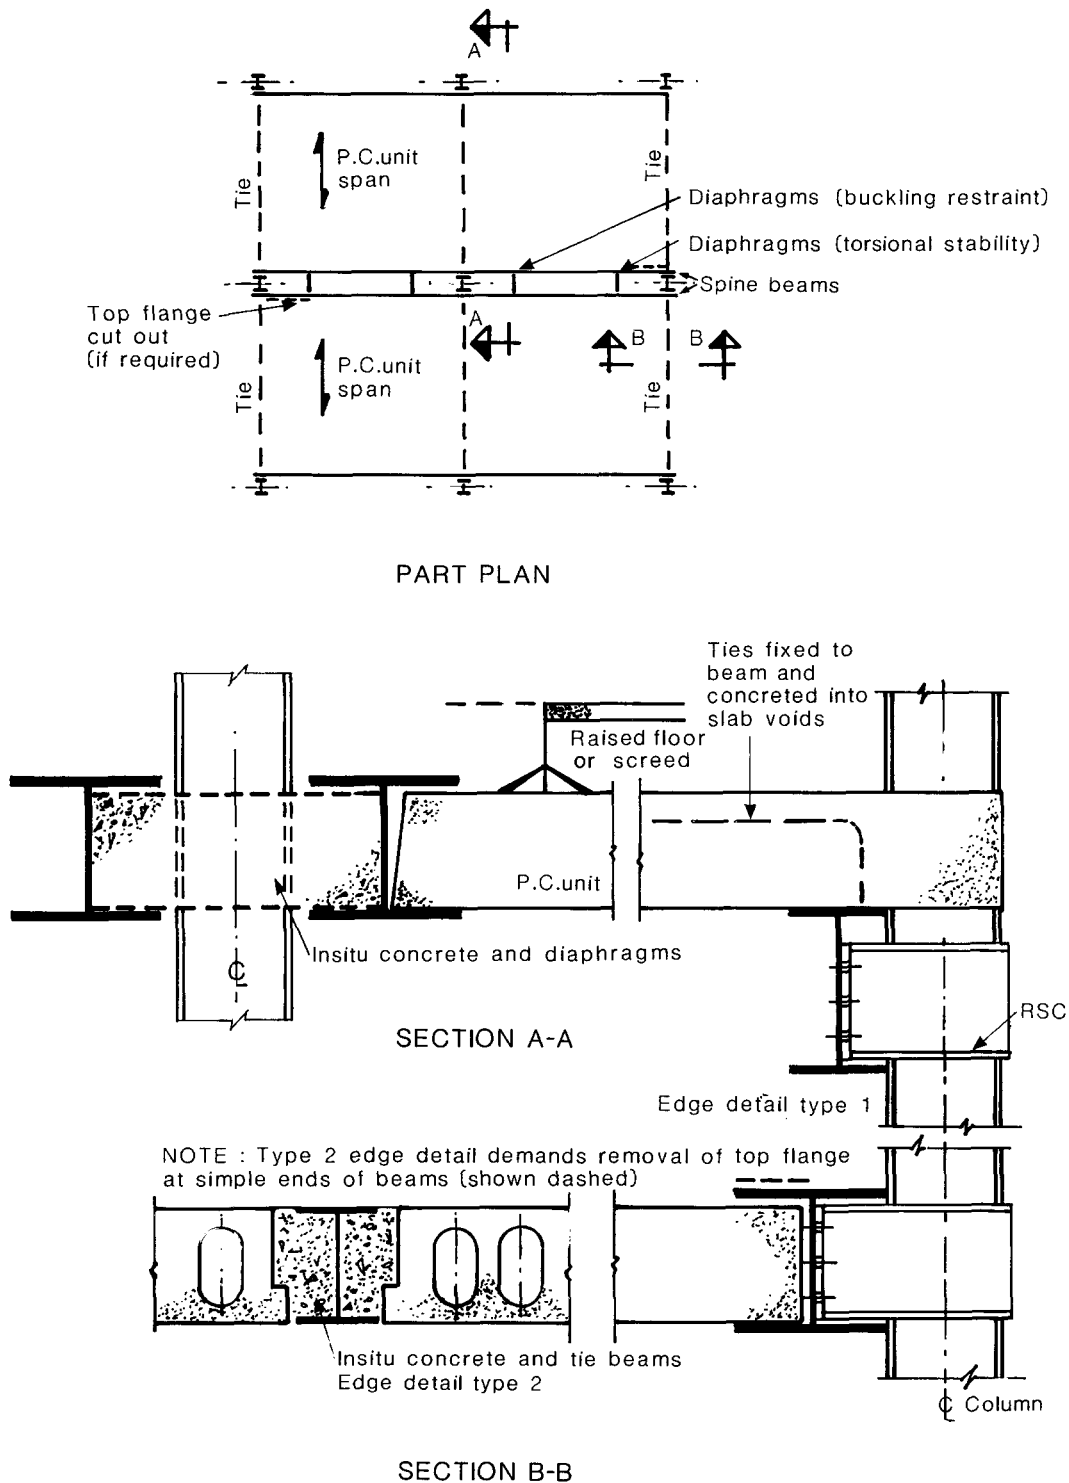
Use of P.B.A. with precast planks and 'slim' floor construction
